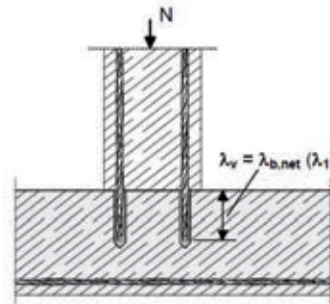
Rebar connection for components stressed primarily in compression. The rebars are stressed in compression
